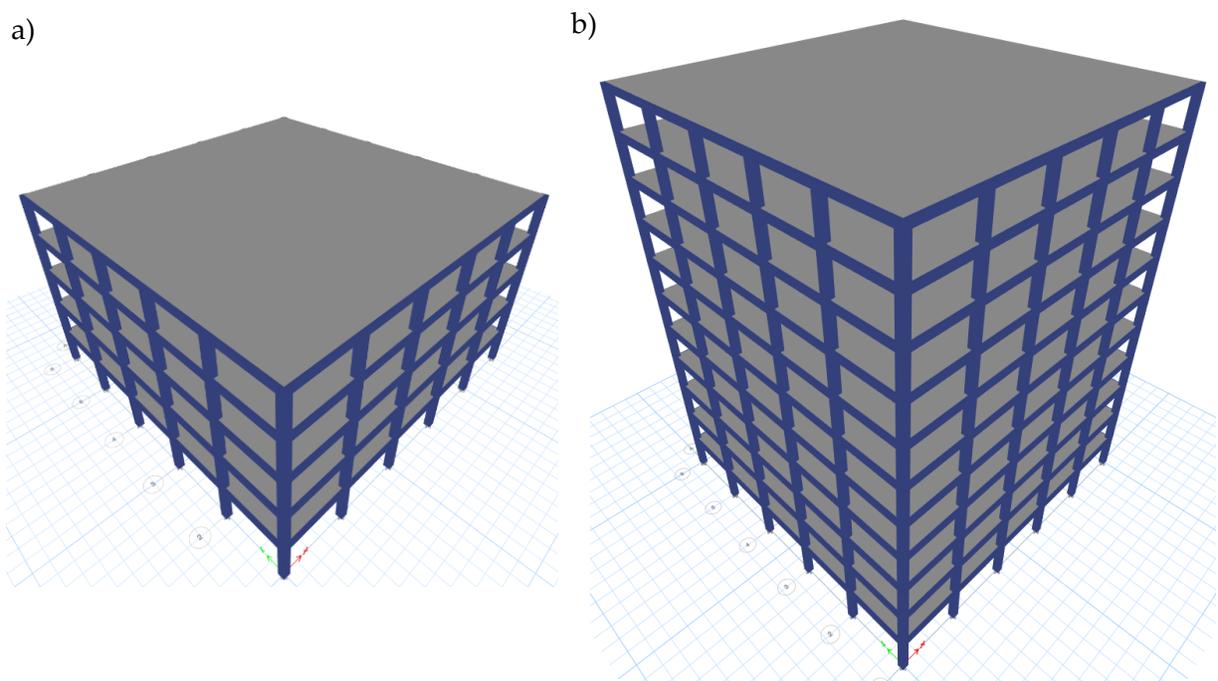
3D-plan view of the Building A (a) and Building B (b)
